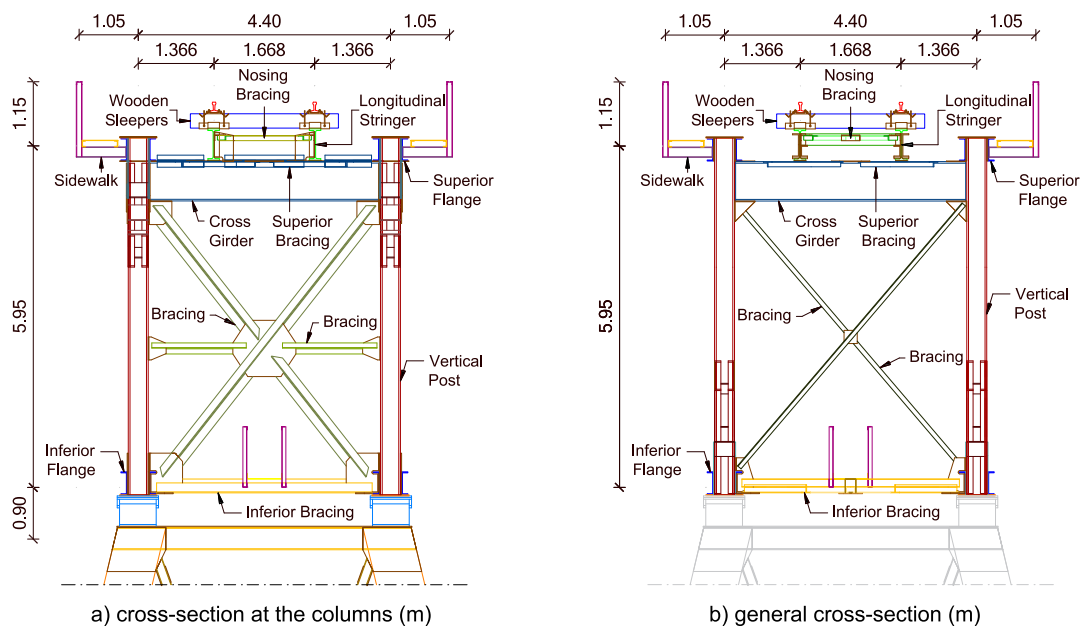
Cross-sections of the Várzeas Bridge (schematic drawings).
